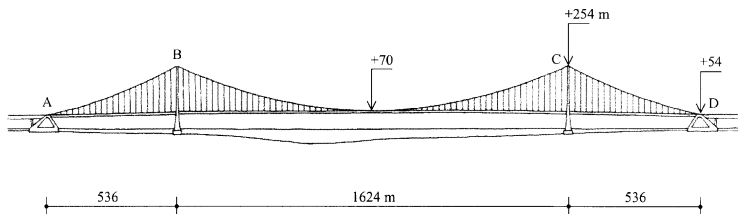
Suspension bridge over the Storebaelt (Large Belt) in Denmark.
